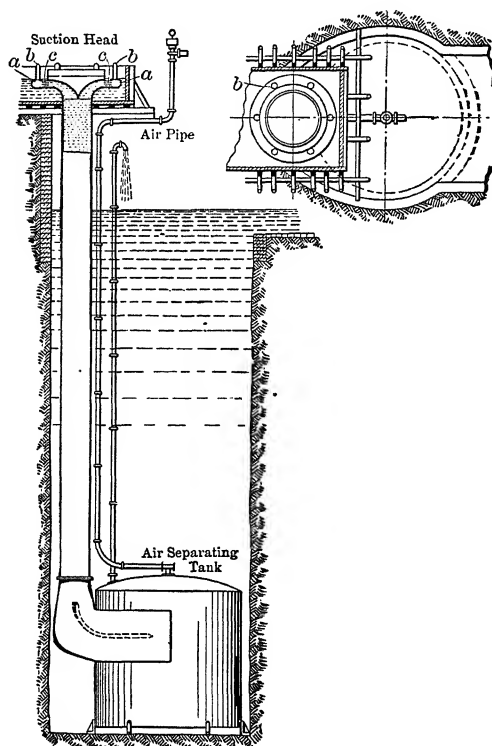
HYDRAULIC AIR COMPRESSOR.
